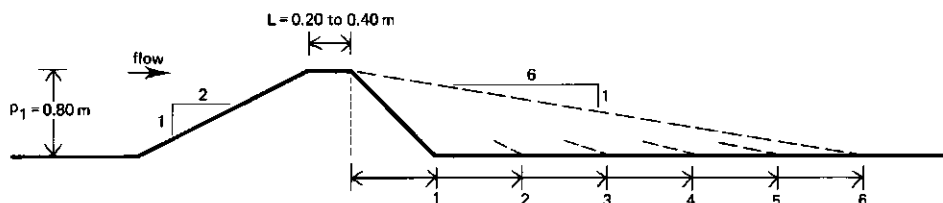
Longitudinal section over weir tested by Bazin, 1888
